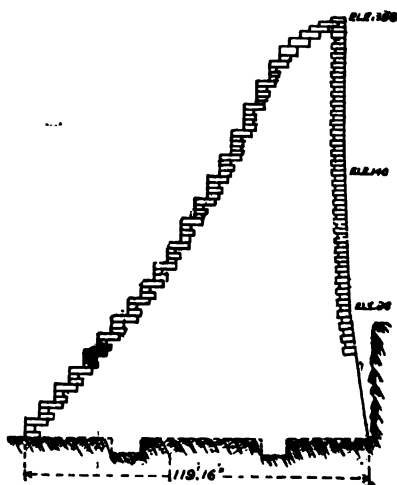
Cross-section of Overfall Weir, New Croton Dam, Cornell's.
